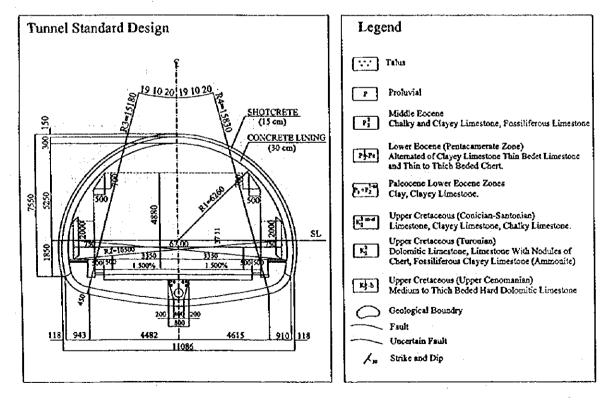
Mt. Kassioun Tunnel Layout
